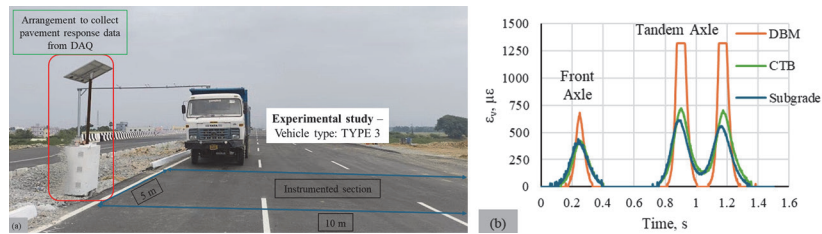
Instrumented pavement section: a) vehicle type used for experimental study, b) response of pavement system at 20 km/h
